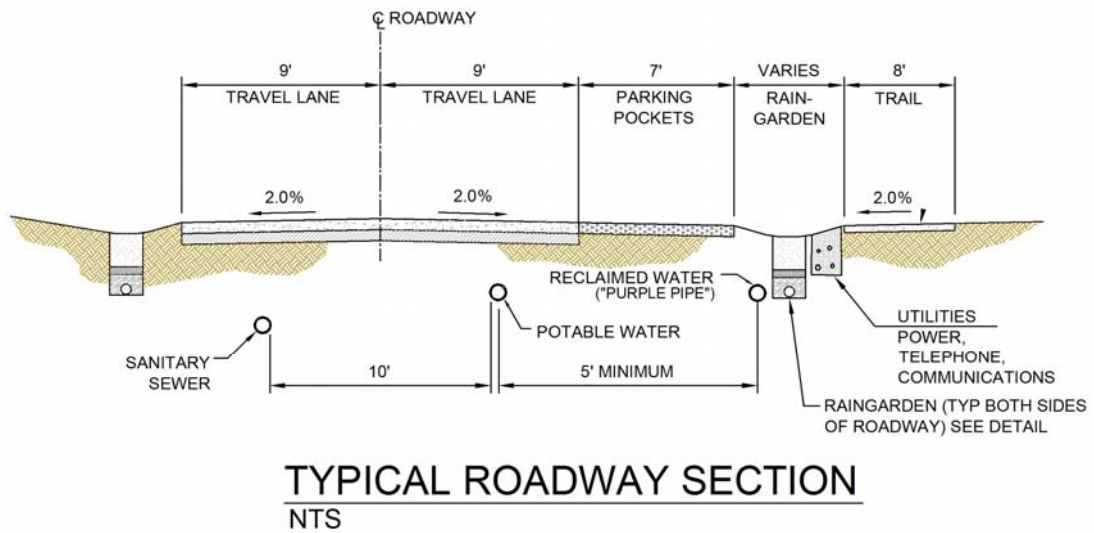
Typical LID Roadway Section (including narrow travel lanes and raingardens)
